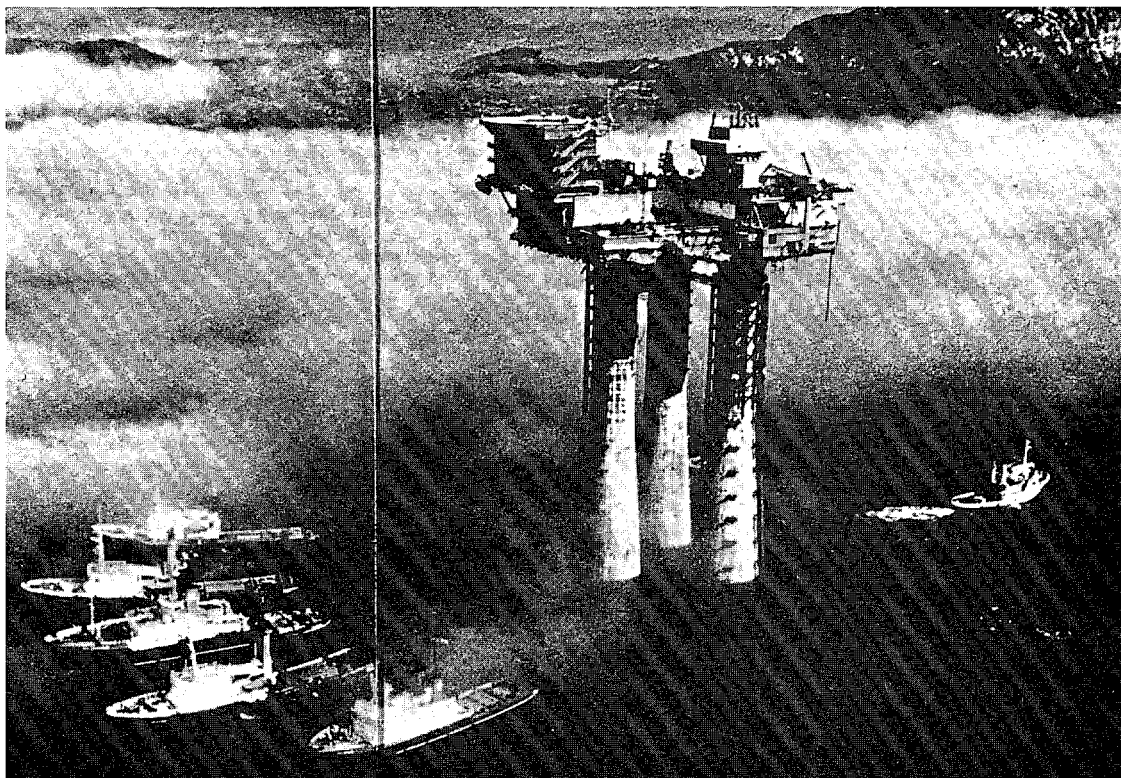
Condeep, prestressed concrete floating structure being towed to sea.
